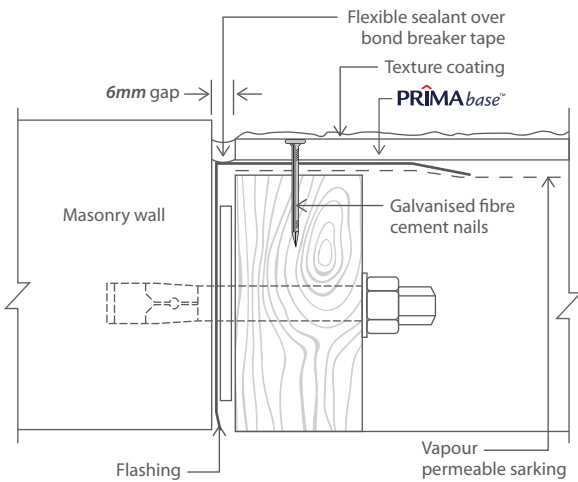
Vertical Movement Joints - Intersection with Masonry Wall
